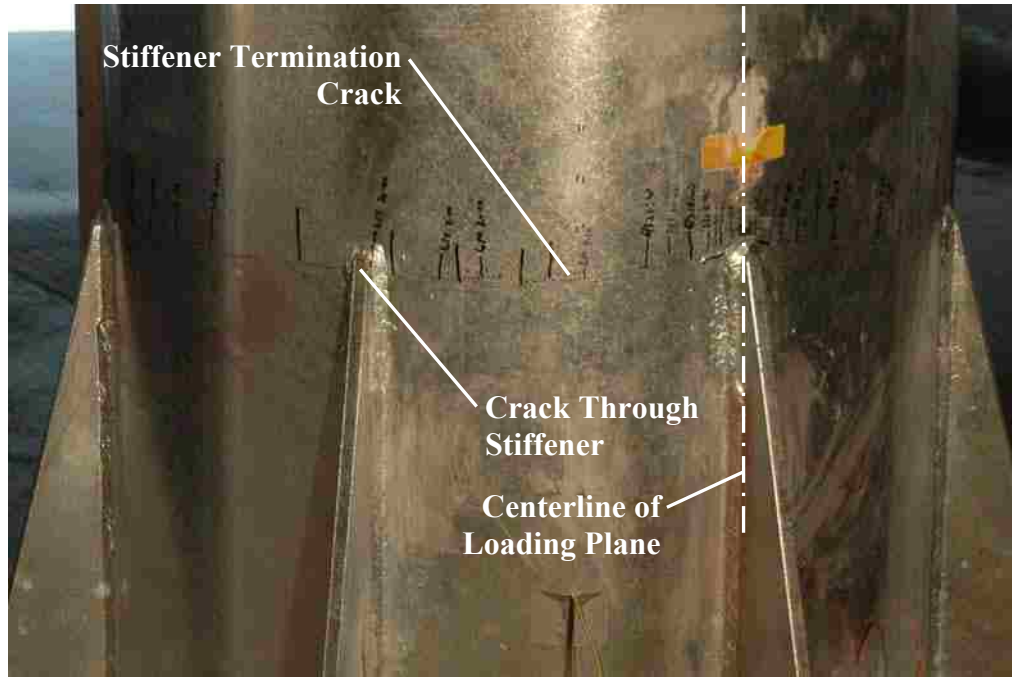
Final crack at termination of fatigue testing of specimen XII-4
